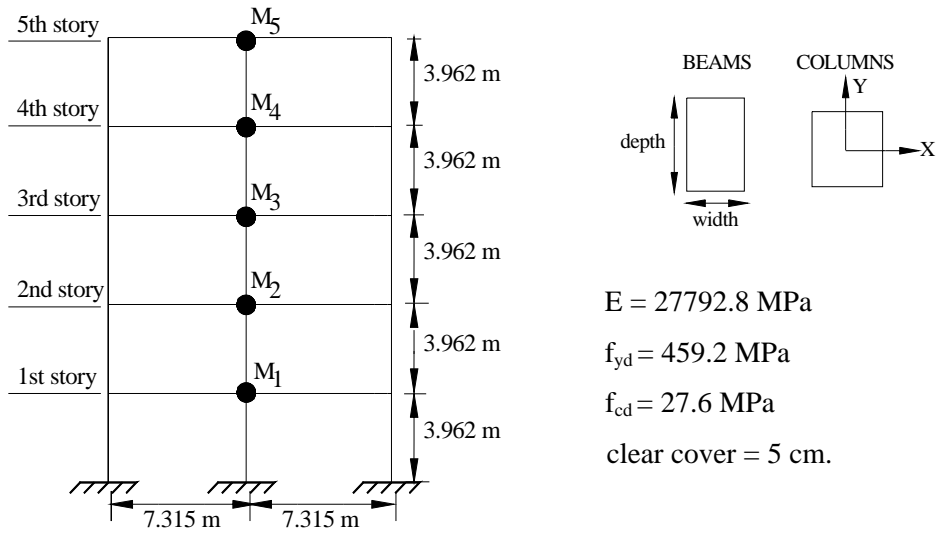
The Configuration of 5-Story Reinforced Concrete Frame (x)
